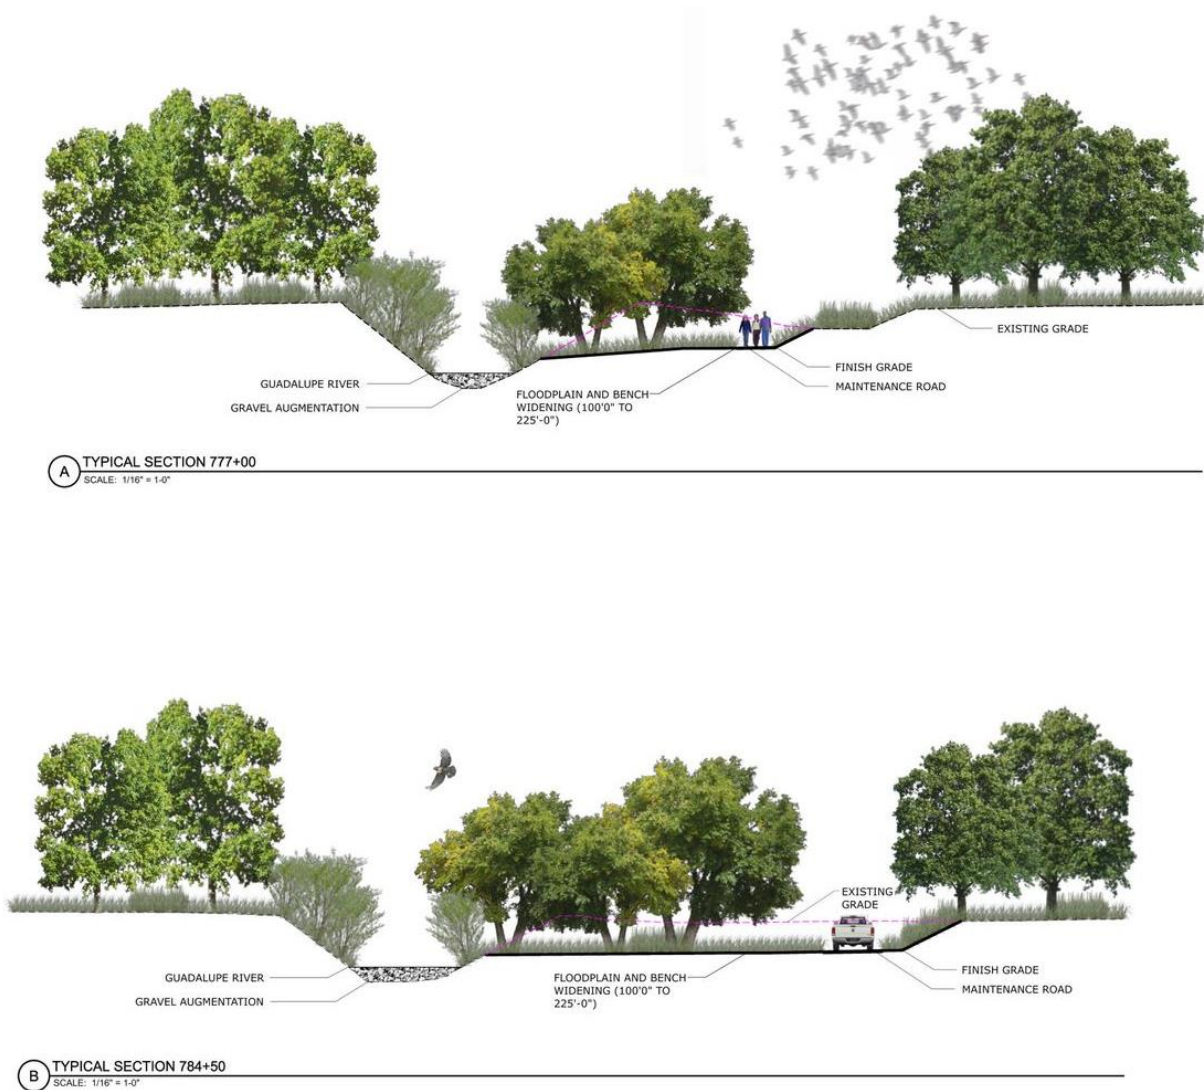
Conceptual cross-section of proposed plantings in the Combination Plan
